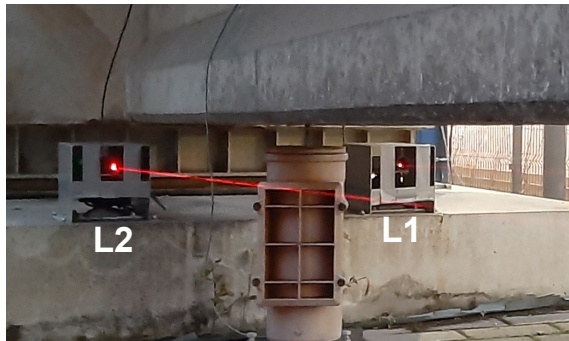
Position of two lasers on the concrete foundation at fixed bearing
